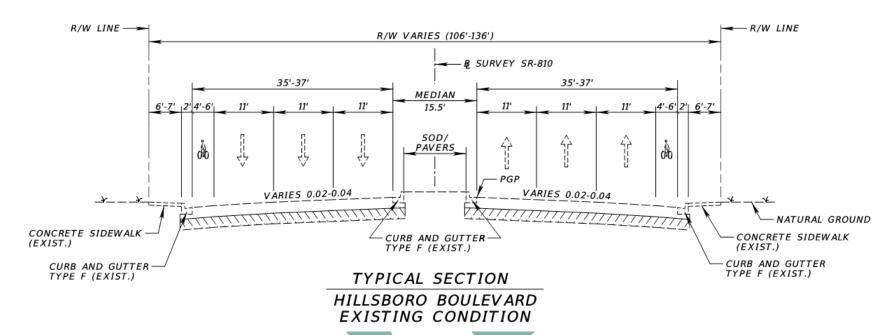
7: Existing Typical Section – Hillsboro Boulevard
